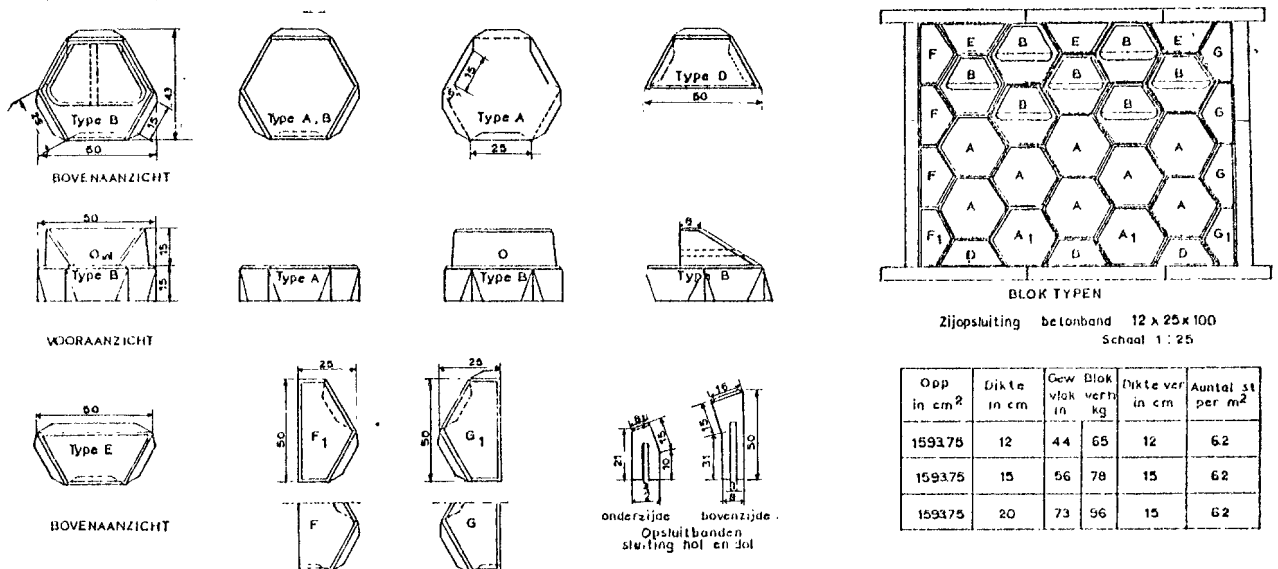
INTERLOCKING PRECAST CONCRETE BLOCK
